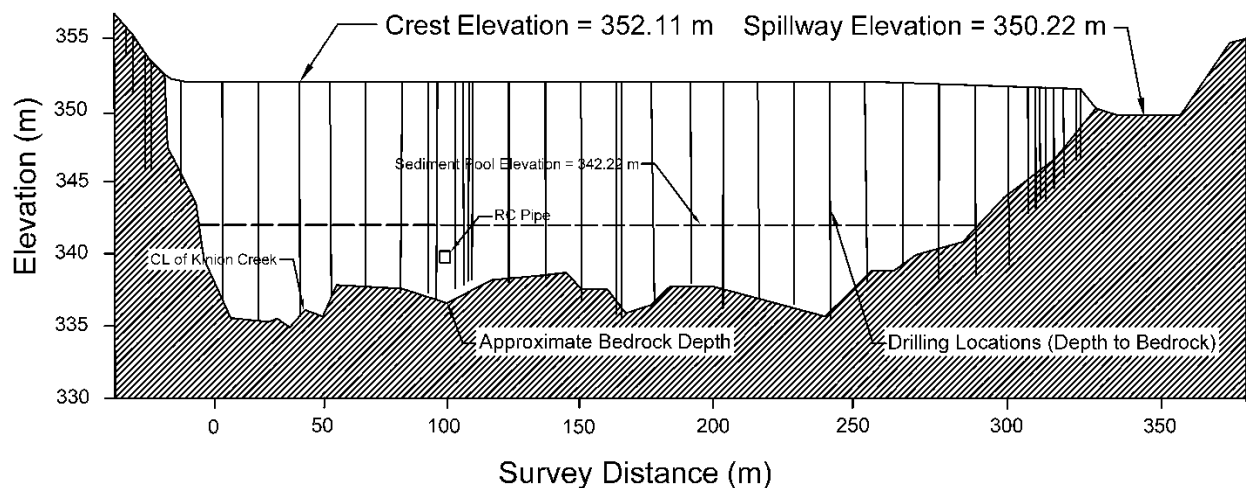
Bedrock profile modified from the 1963 drilling and grouting report showing depths to bedrock encountered during drilling (SCS, 1970).
